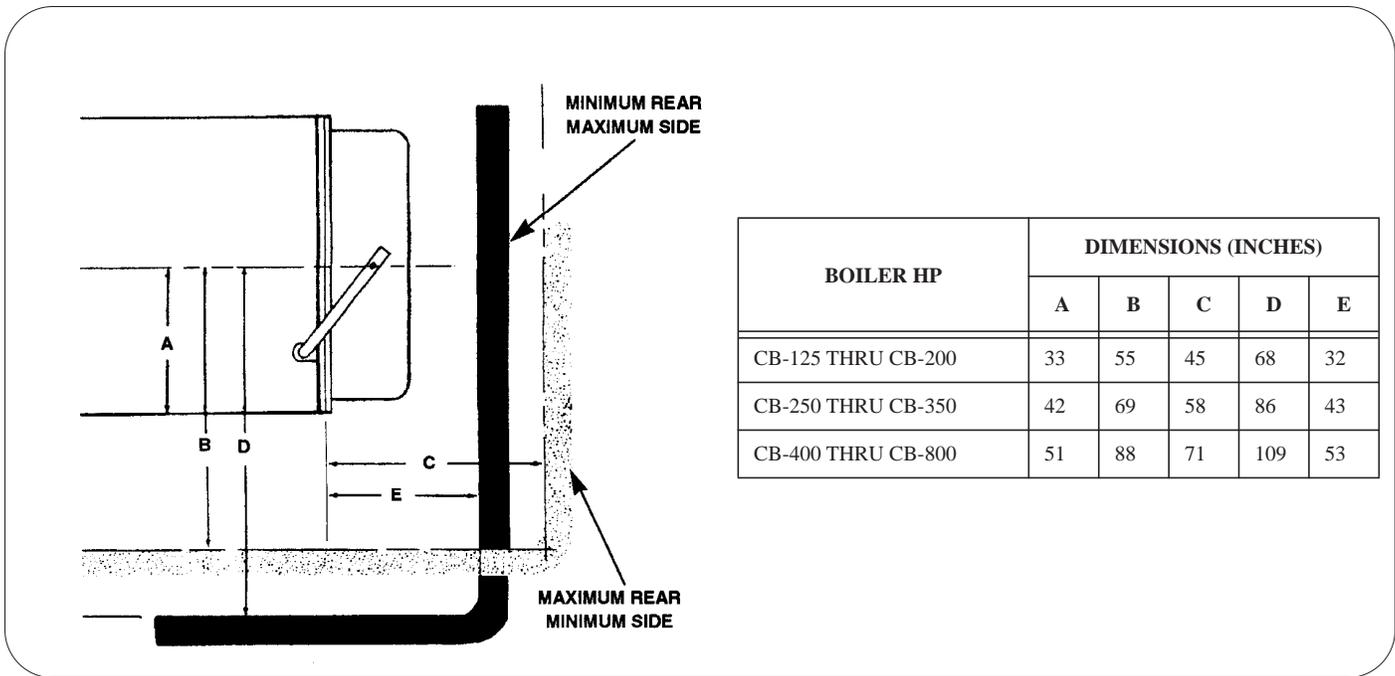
Space Required to Open Rear Head on Model CB-LE Boilers Equipped with Davits
